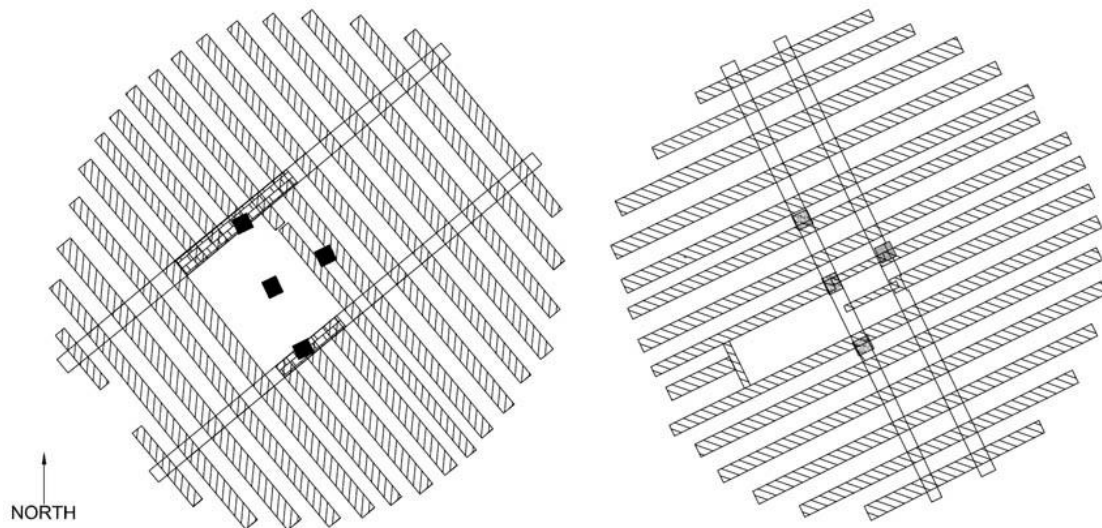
Illustration of both floor structures showing the general appearances. First artillery floor (Left) and second artillery floor (Right).
